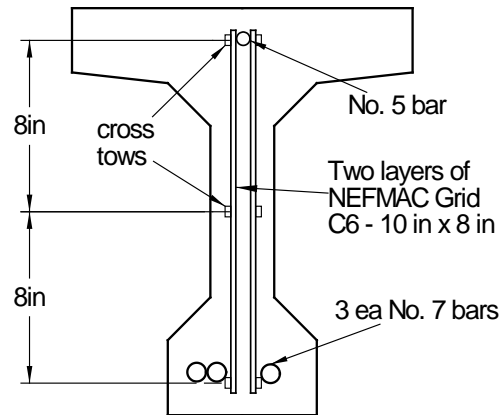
Cross-Section of Specimen 5 Typical NEFMAC Reinforcement
